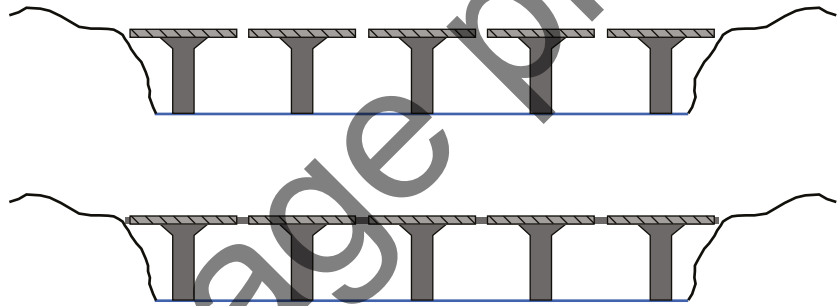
Each beam in the cantilever bridge is fully supported by the pillar below the beam. No added support is provided by connecting the beams.
